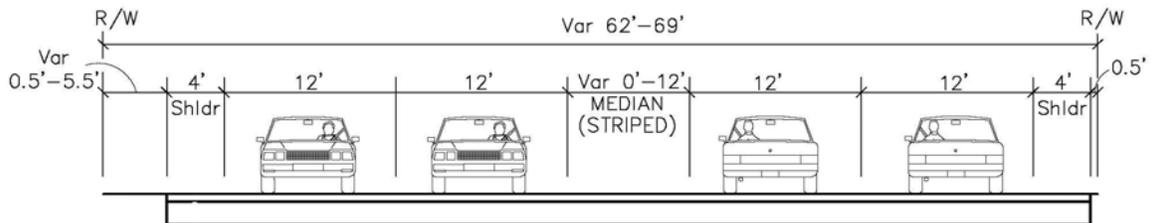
Segment 2 – Interim Roadway Section – Lower Sacramento Road to Legacy Estates (Looking East)
